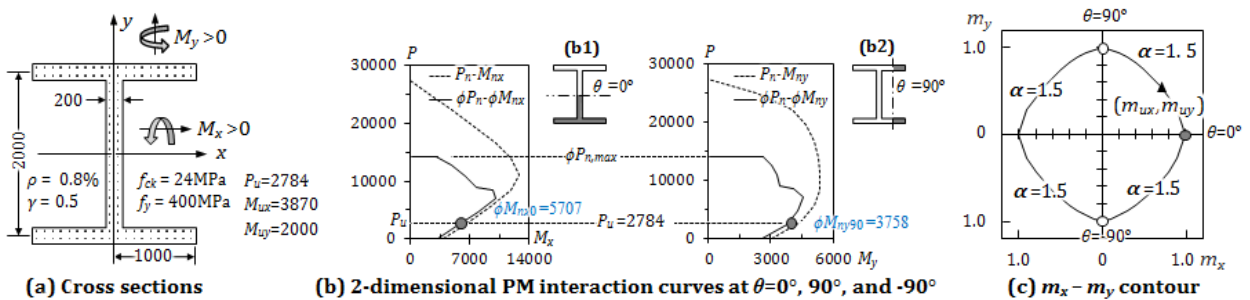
Flexure-compression design of a biaxially loaded H-shaped wall using proposed load contour method
